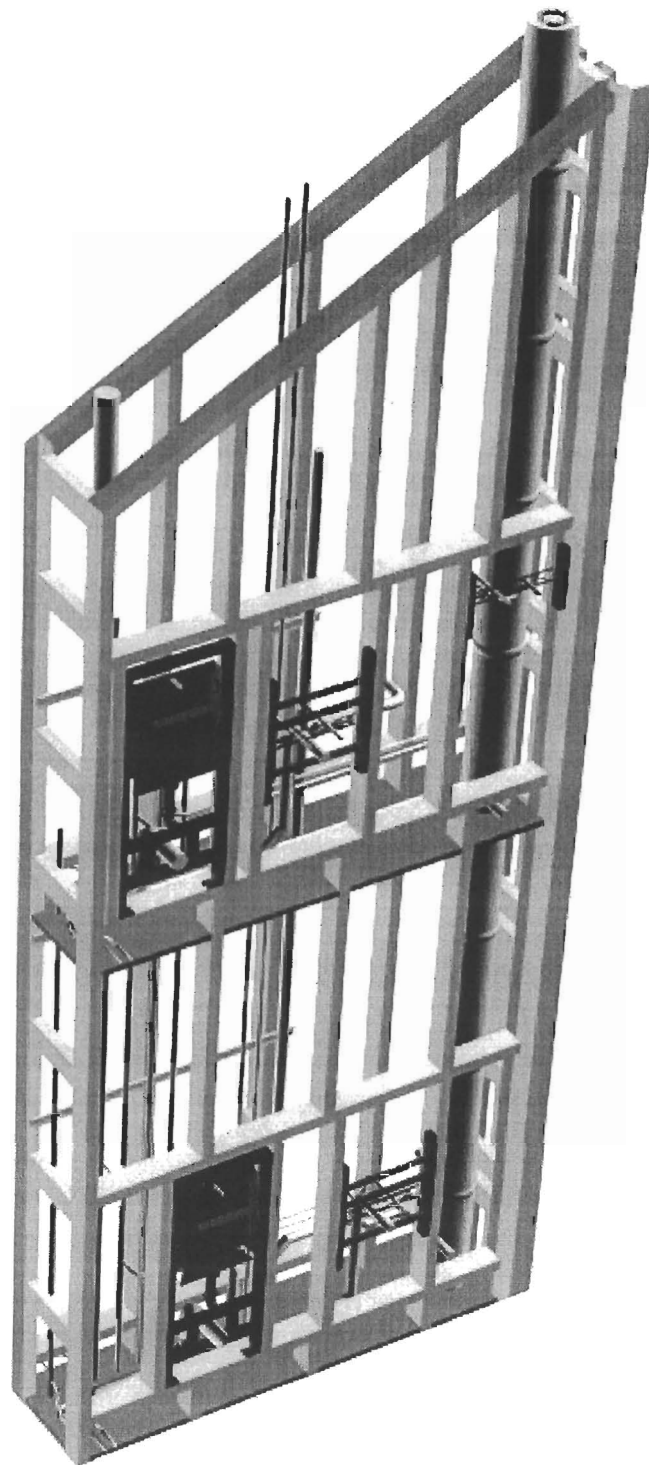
View of an all storey high installation module without planking. The assembled pipe modules and the mounting elements for toilet, wash basin, shower etc. are shown. The prefabricated exhaust pipe of the heating system is integrated into the right side.
